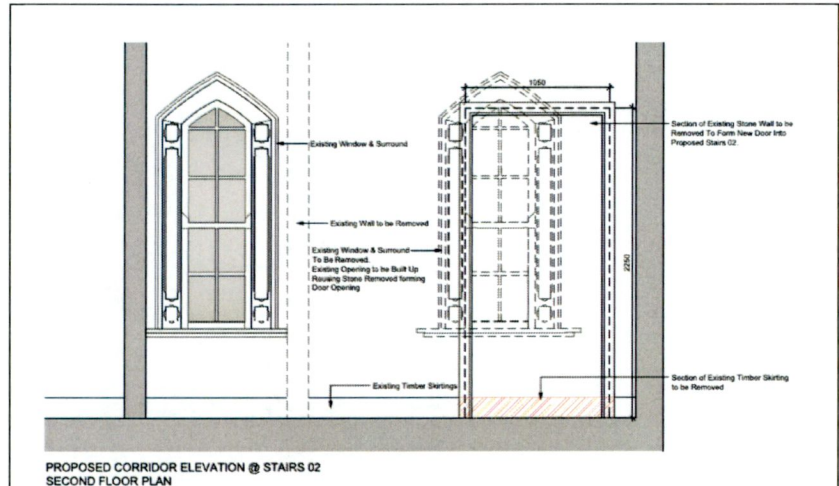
Second floor corridor indicating the forming of a new opening to proposed new stair tower 02. Existing window to be replaced with new doorway.
